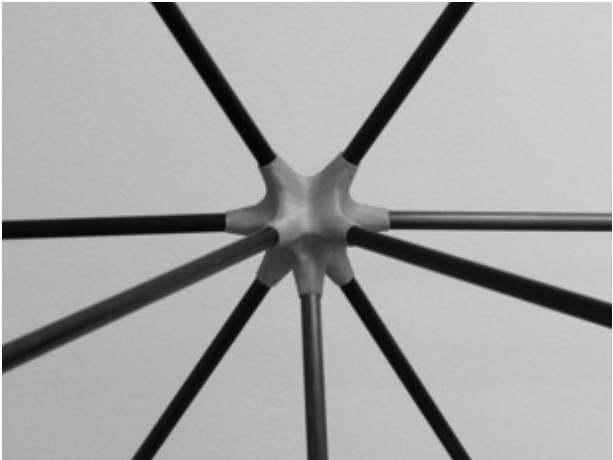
Prototype 3D-Printed Optimized Joint. *Use of 3D-printing techniques with a highly dexterous print head can enable fabrication of joints optimized for the service loads, maximizing structural efficiency.
